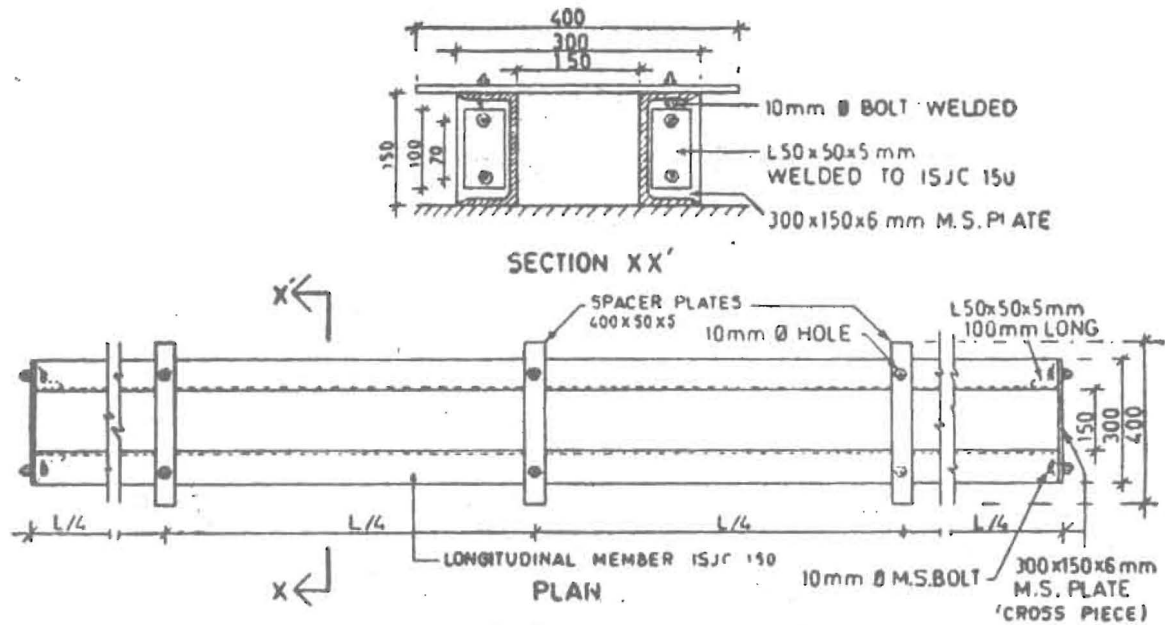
B : STEEL MOULD FOR PRECAST R. C. JOIST
